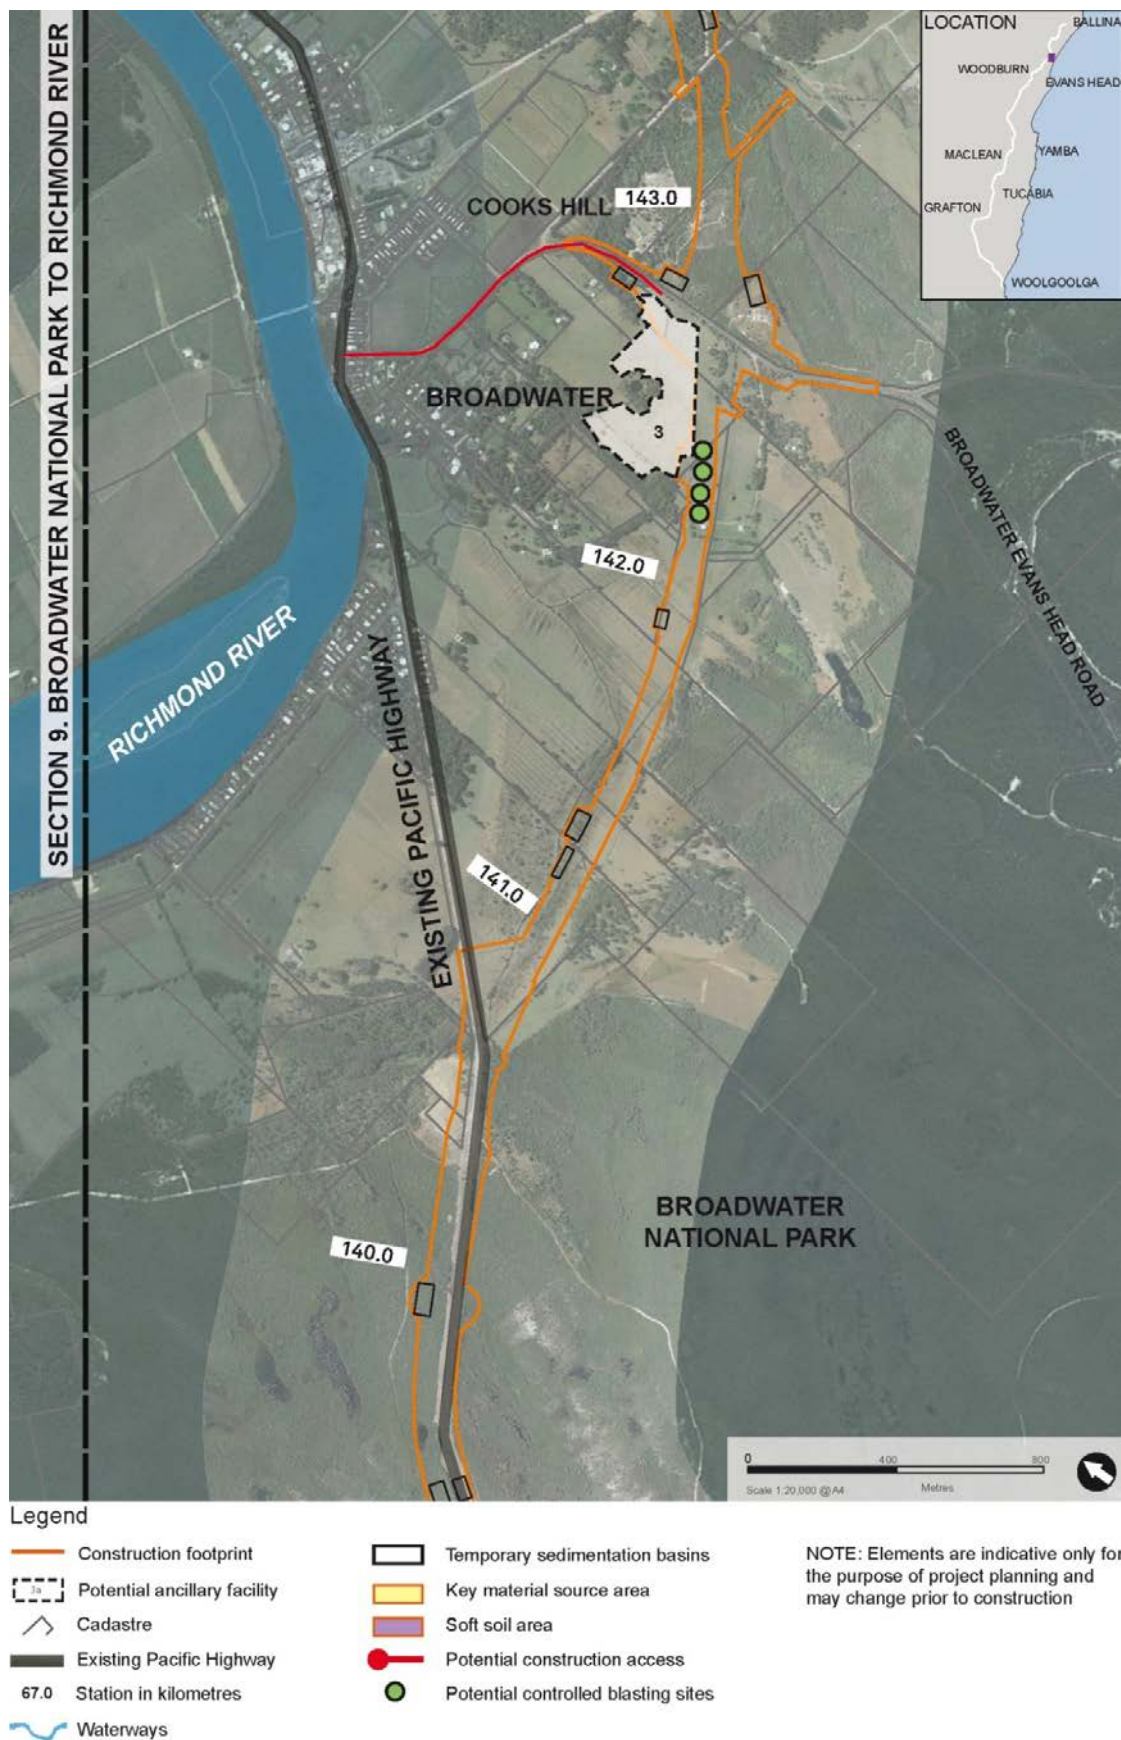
Extent of construction and construction features Section 9 (Station 139.5 to 143.5)
